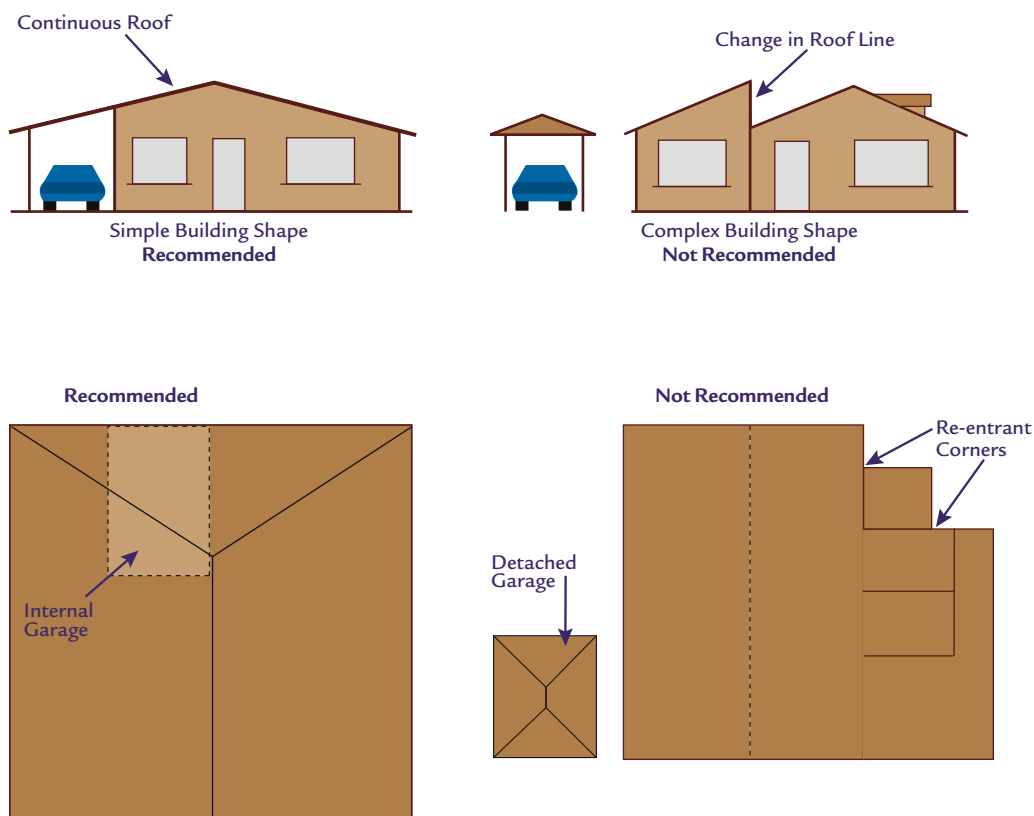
Diagram showing a simple building shape and a complex building shape, highlighting where ledges will encourage the accumulation of embers and windborne fuel.
